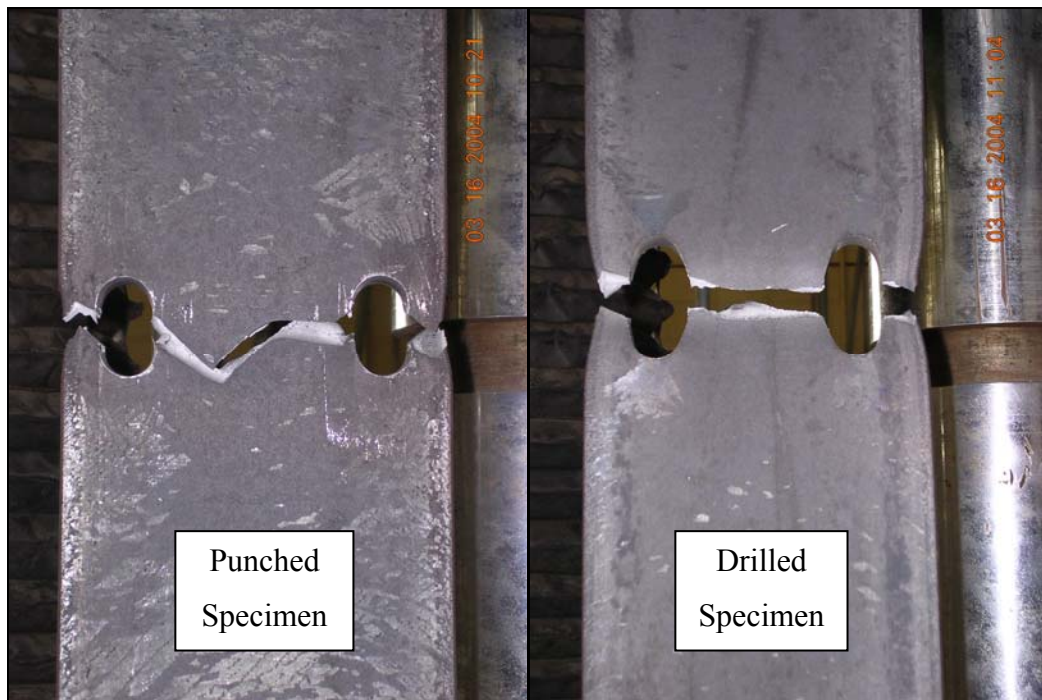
Fractured Punched Hole and Drilled Hole Specimens
